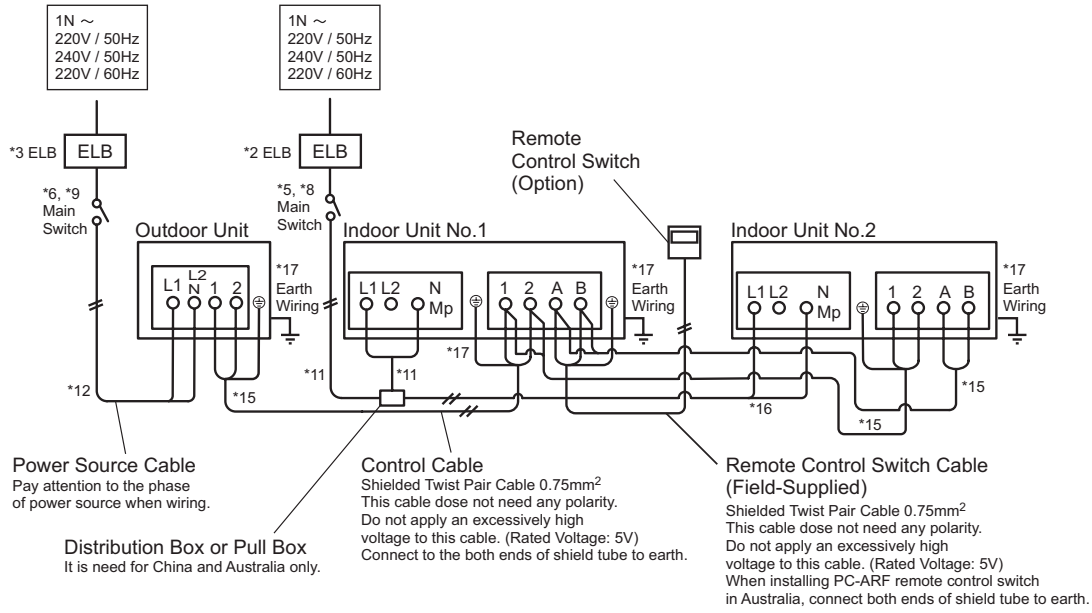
Wiring Connection for Single Type between Indoor Unit and Outdoor Unit
